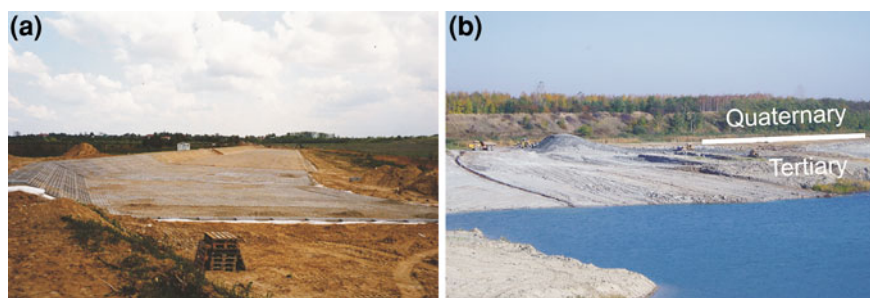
a Machów, construction of embankment—on the geotextiles are arranged openwork concrete plates; b Piaseczno, trimming slopes and isolation of gypsum and sulfur limestone outcrops by 2–5 m layer of cinereous clay and loam, photo Z. Pantula
